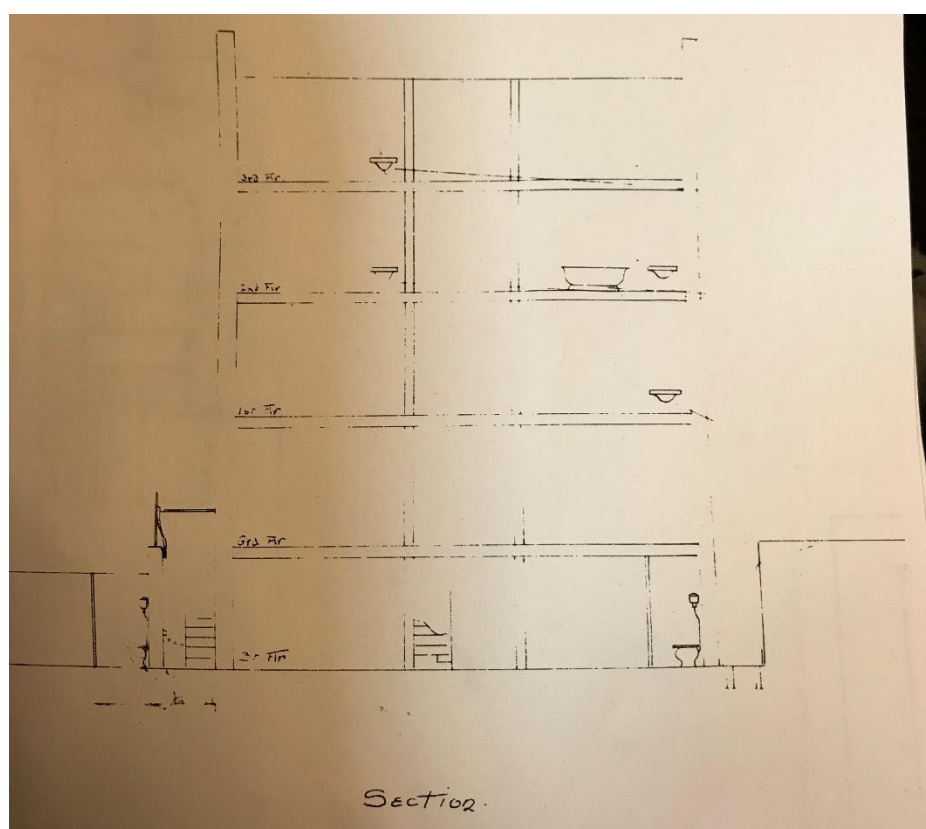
1926 drainage plan of no. 17 Park Square East. Section. Camden archives.
